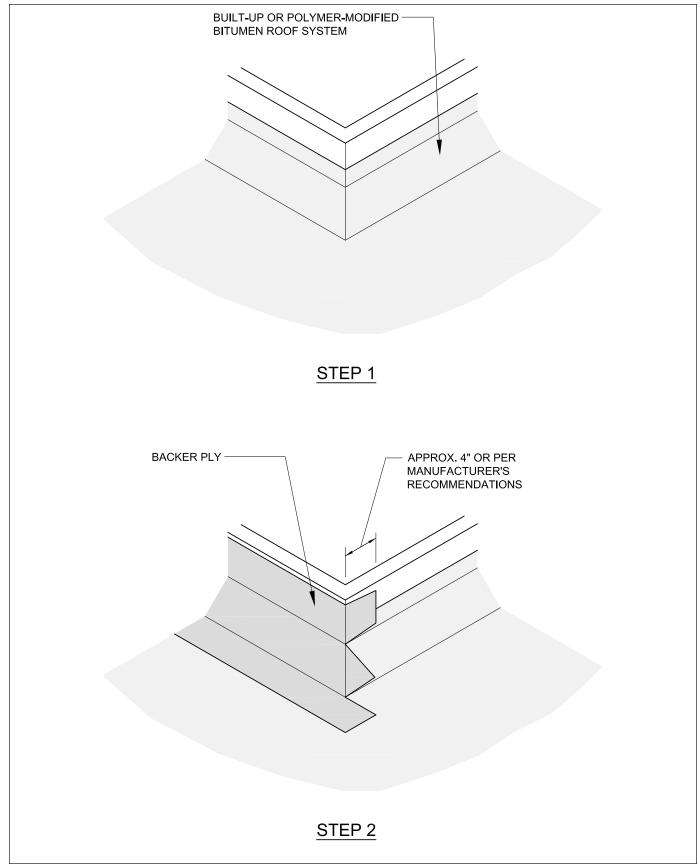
BUR and polymer-modified bitumen roof membrane inside corner flashing application (continued)
